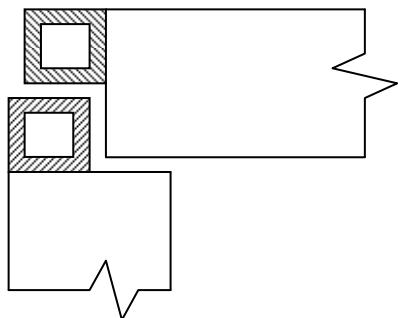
Scheme of strengthening in connection of the wall and roof [1]
